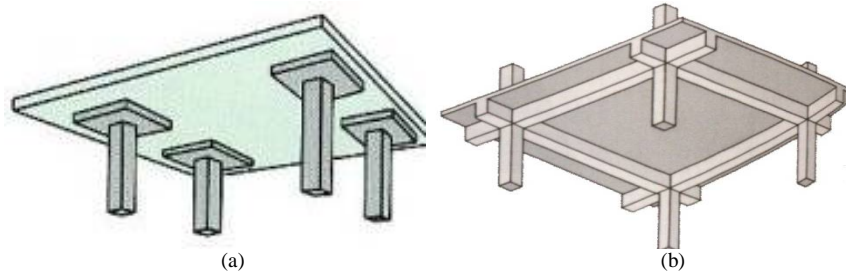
Comparison between one-way and Two-way slab (a) Flat slab (b) Two way slab
